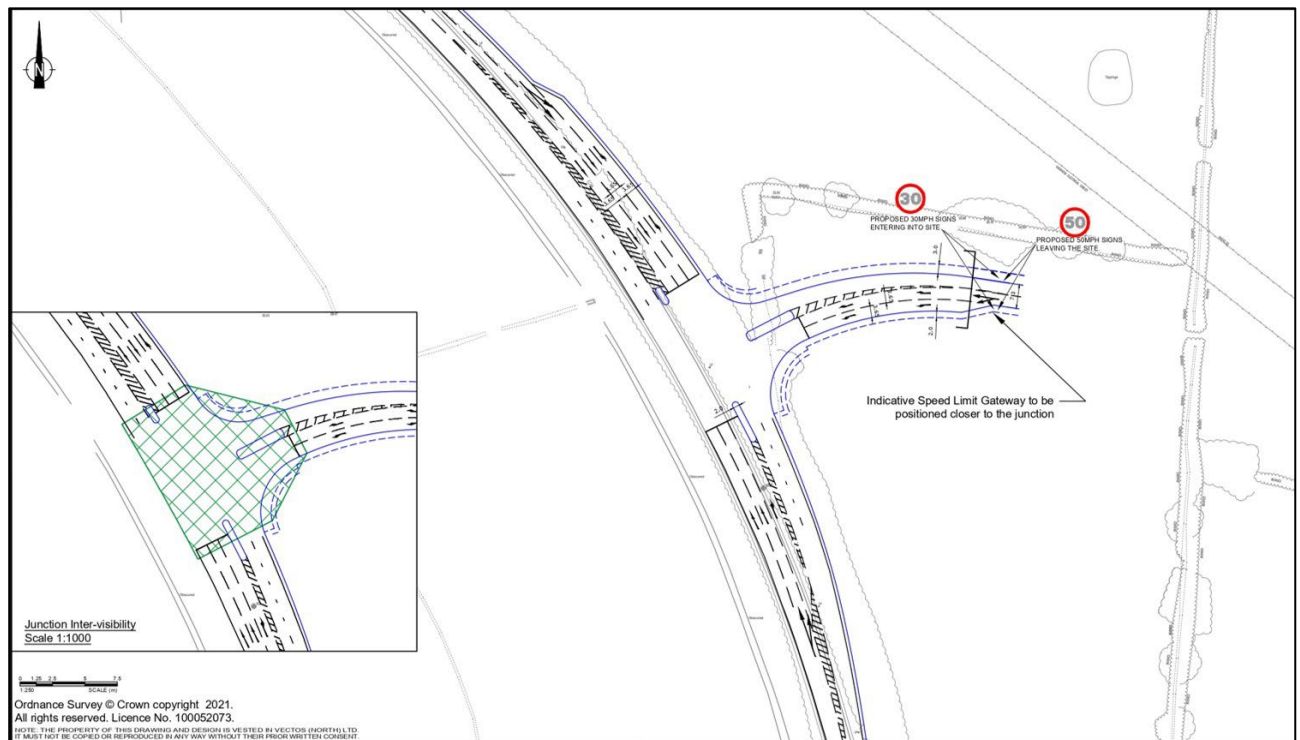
Site Access Design – Penwortham Way Single Lane
